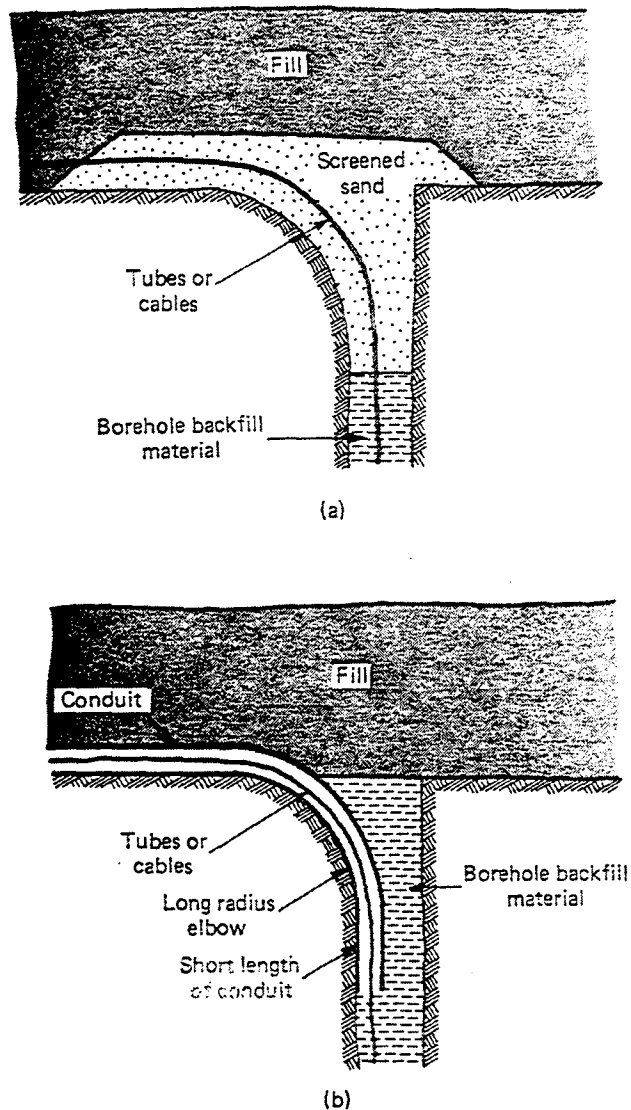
Typical Arrangements for Protecting Tubes and Cables Where They Emerge from a Borehole: (a) Without Conduit and (b) with Conduit. (after Dunnicliff, 1988, 1993)
